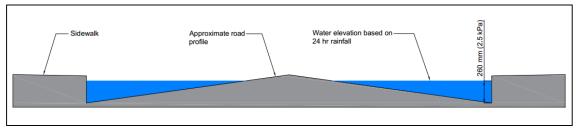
Water Distribution Across Bridge Section (Alloy Consulting Ltd., 2015)
